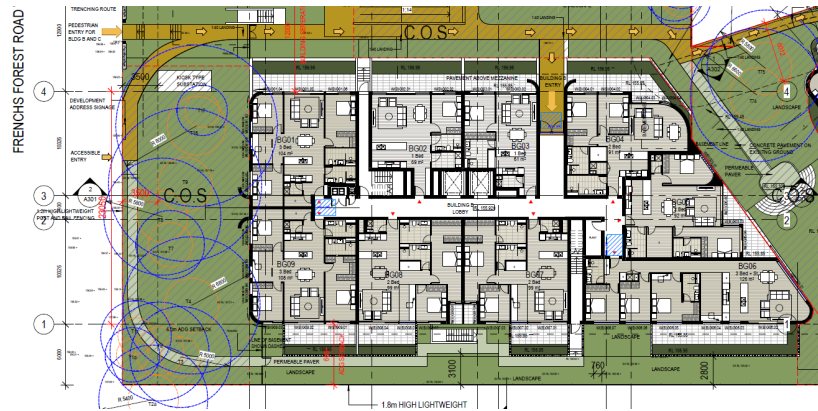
Landscape Setbacks for Building B (Revised Scheme - Rev B)
